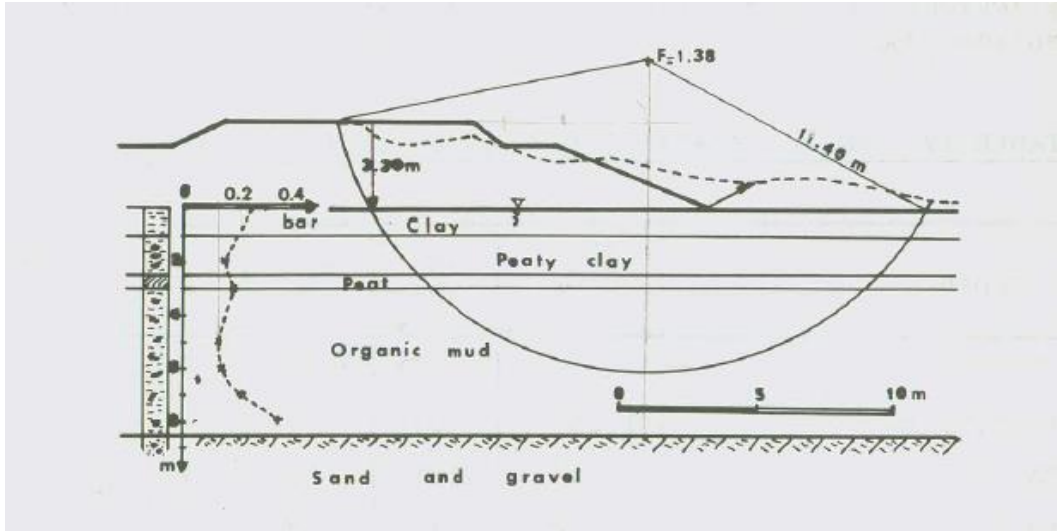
61 Embankment Failure at Saint-Andre (Pilot 1972)
